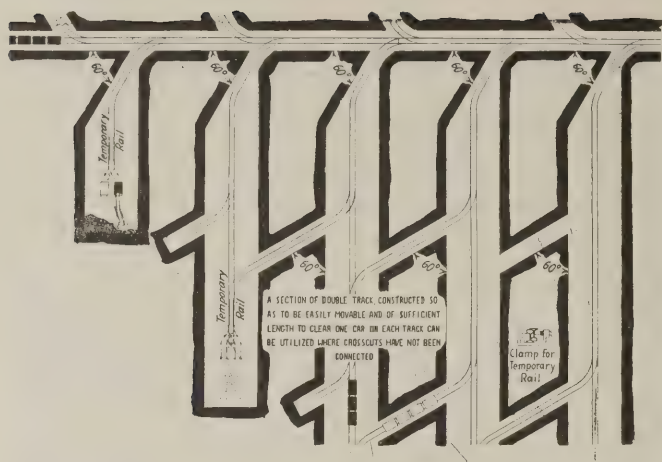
Trackage System for an Advancing Machine-Loading Panel
